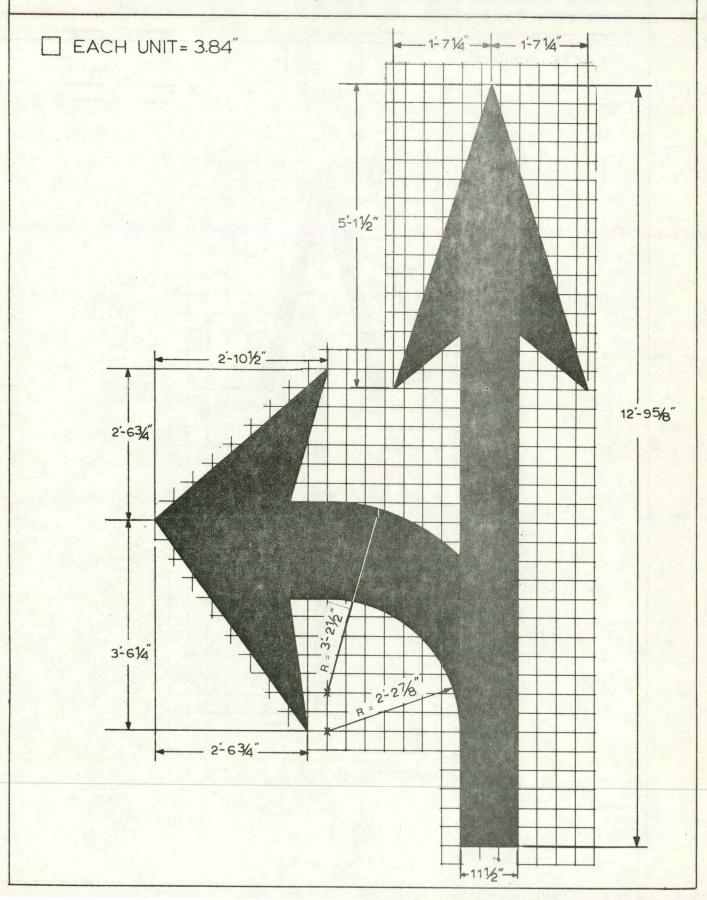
Pavement Markings Freeway, Expressway Ramp Pavement Arrow
